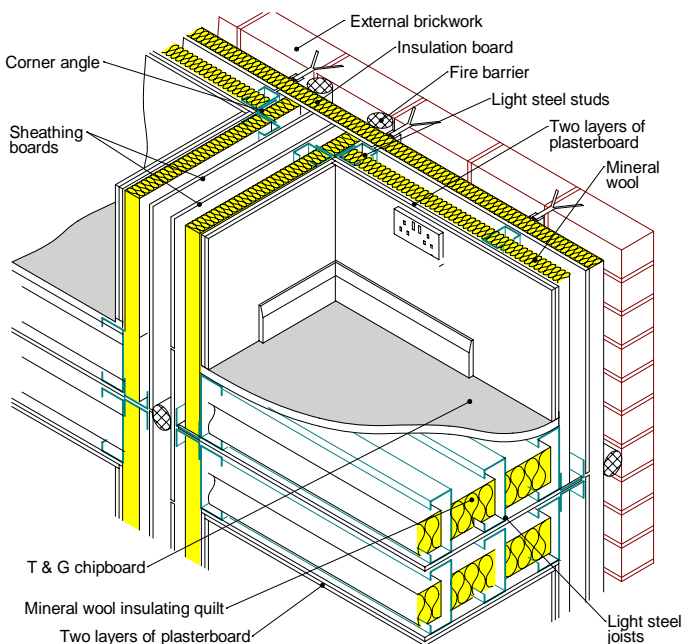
View of floor and wall in modular construction showing fire protection and cavity barriers
